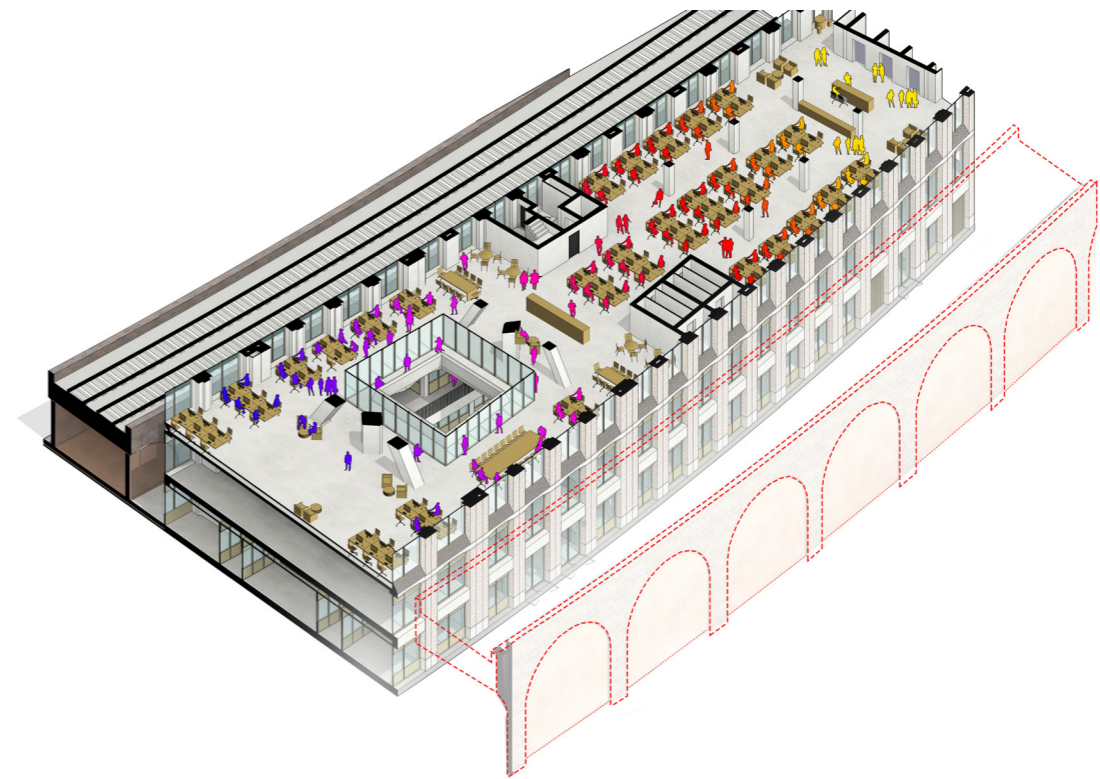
Publicly Accessible Open Space second floor axonometric diagram
